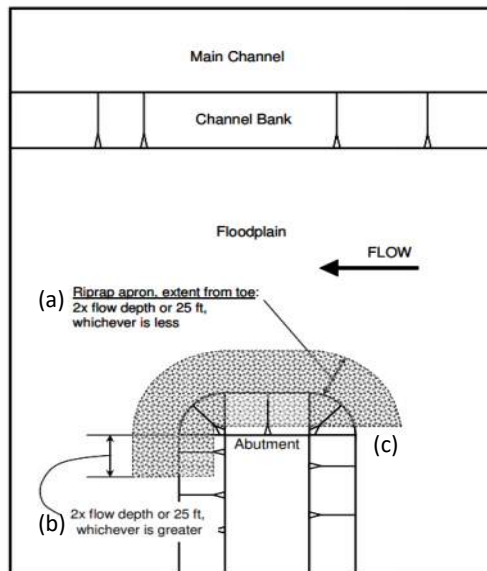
Plan view of the extent of rock riprap apron (Lagasse et al. 2006).
